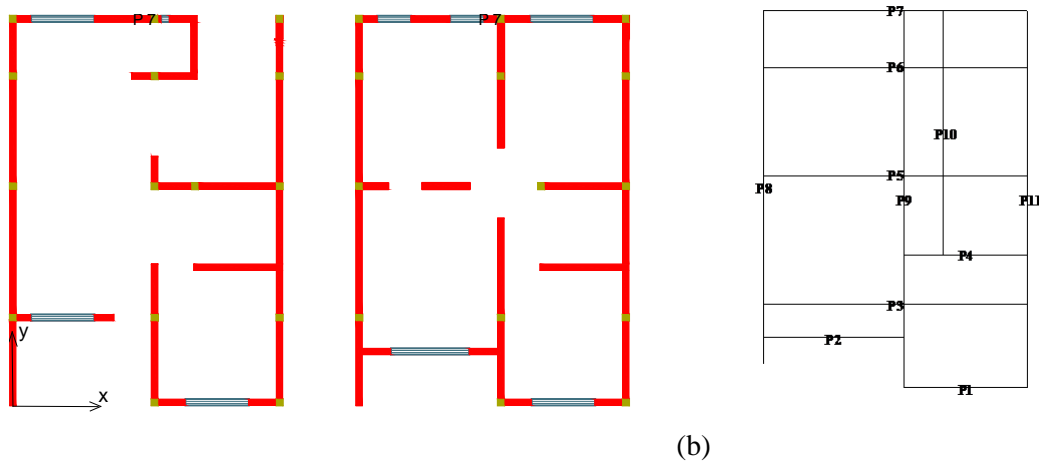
(a) Ground floor and first floor masonry panels distribution, (b) walls definition implemented in TREMURI.
